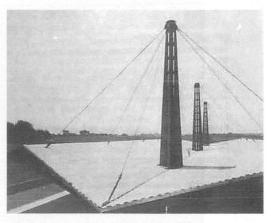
Italtubi warehouse, Rome (S. Musmeci 1963–1967): Suspended cable roof seen from above (Acciaio 1967. 12: 589)
